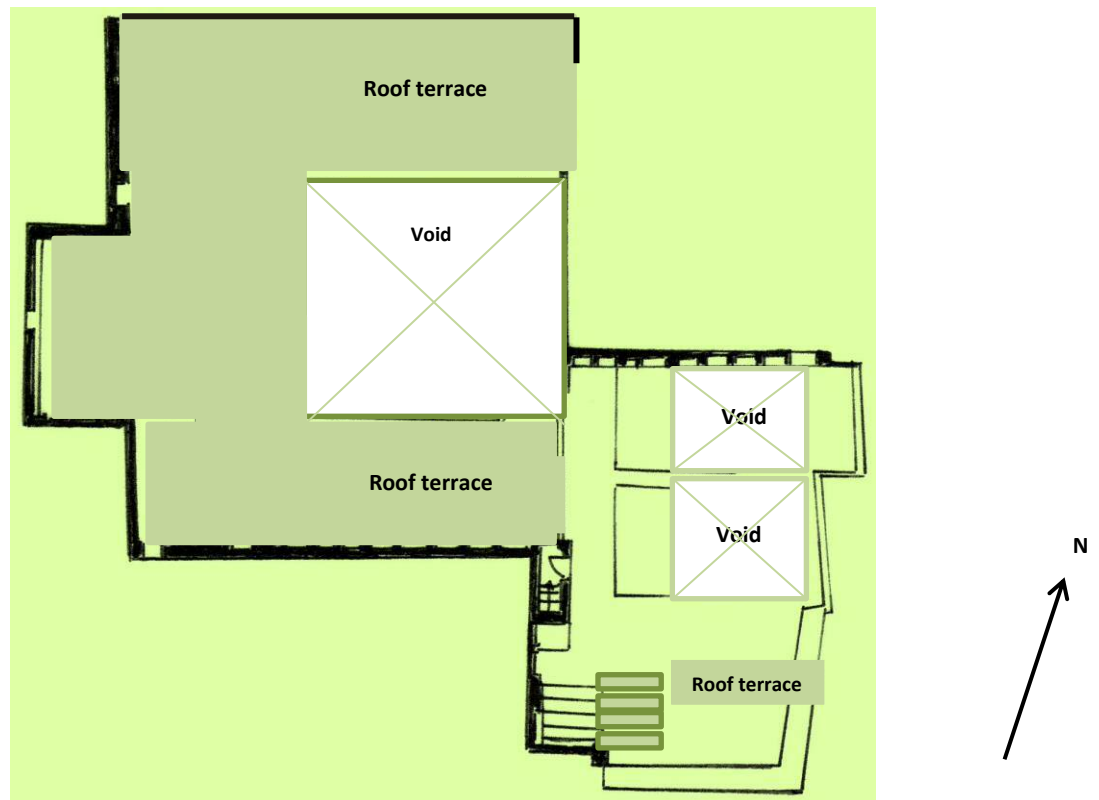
Roof terrace level plan of the traditional courtyard house No. 4.
